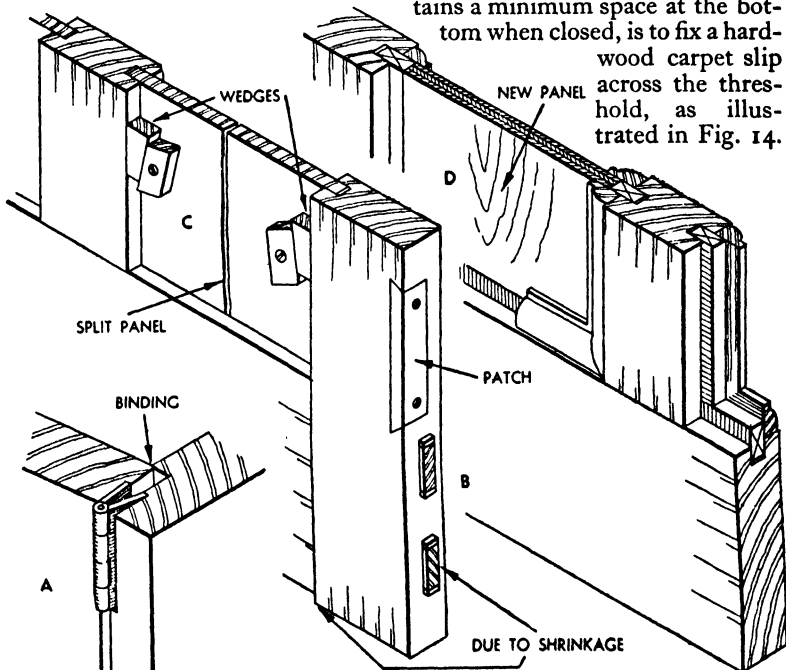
Binding doors and damaged panels. A shows binding on lining. Hinge binding may also be due to the stile shrinking which leaves tenon ends protruding as at B; C, how a split panel can be cramped; and D, how it can be replaced.
